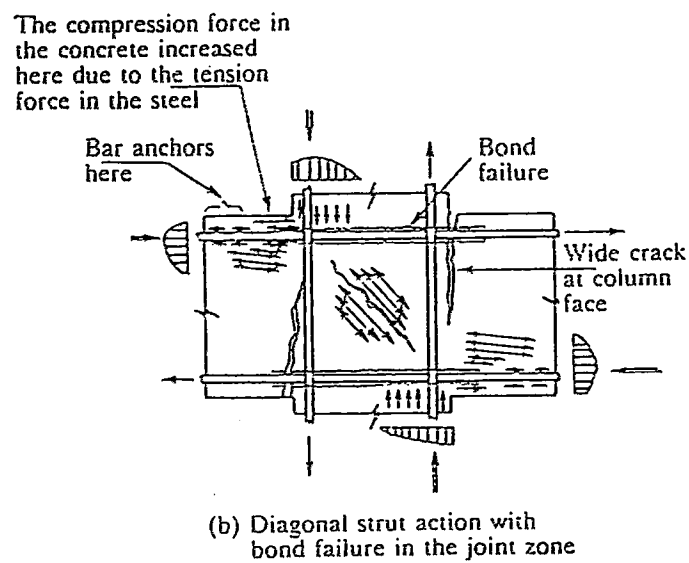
Resisting mechanisms within the joint upon bond failure of beam bar reinforcement
